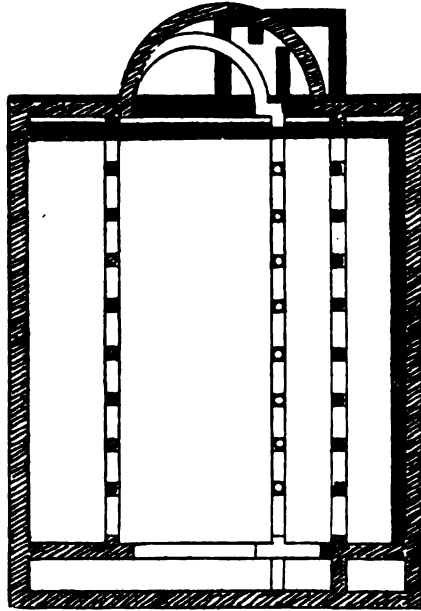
San Clemente, Rome. Groundplan, showing variety of structures.
